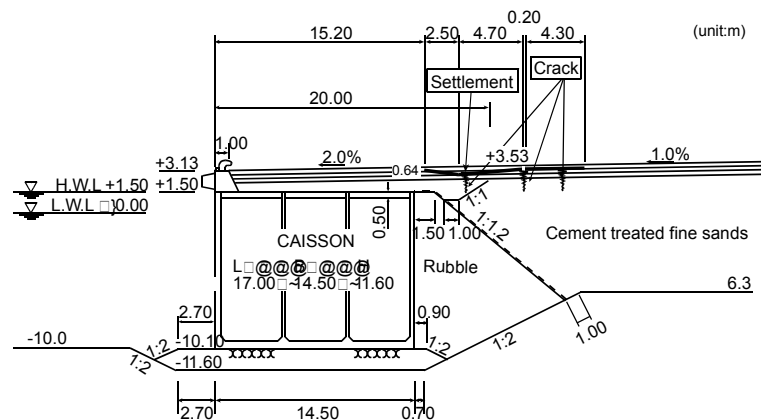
Cross section of -10m caisson type quay wall at Kushiro port No.4 pier
